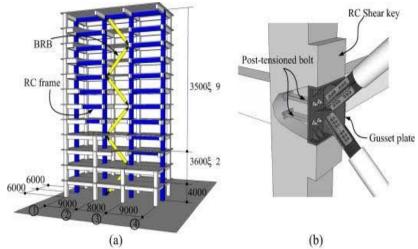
Arrangement and Joint between RCC structure and Steel Bracing
